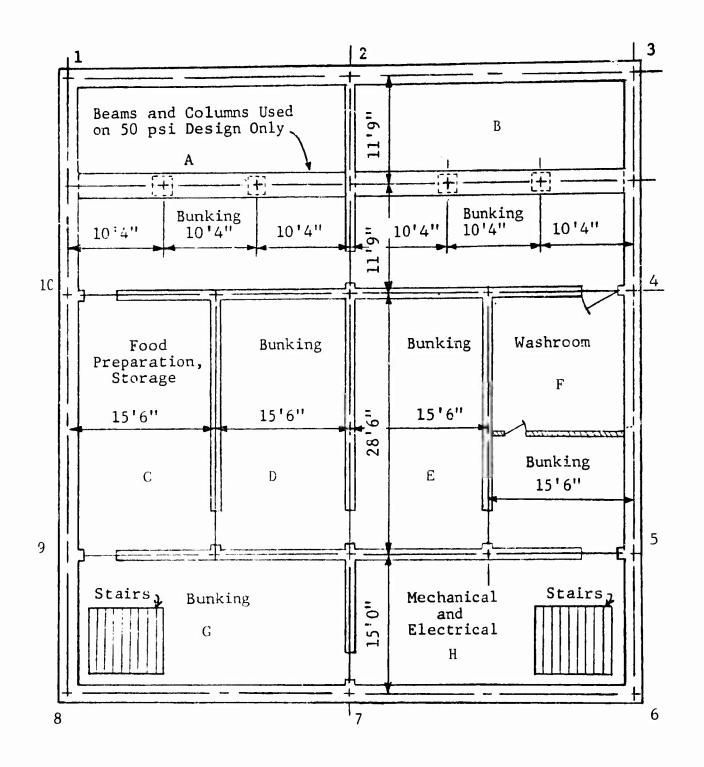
UPPER LEVEL FLOOR PLAN
